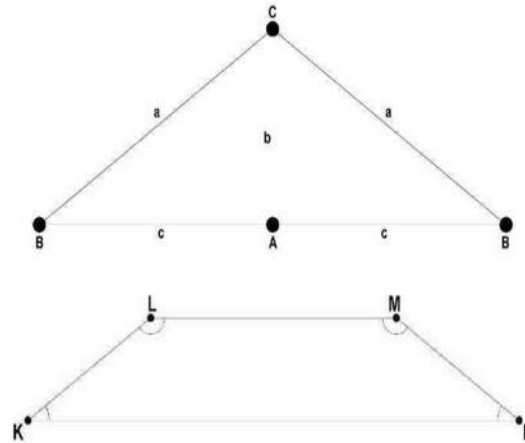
Roof Size / 'Timpa Laja' of Karampuang Traditional House
